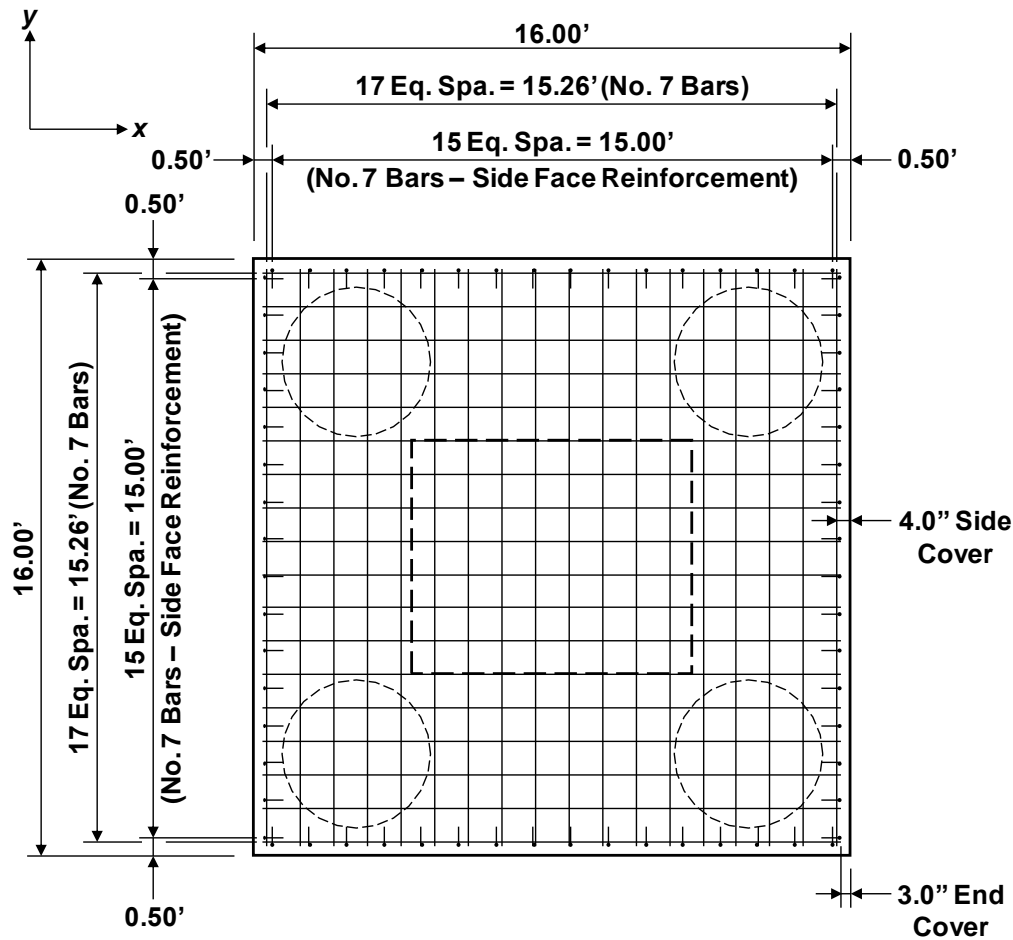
Reinforcement details – plan view (top mat reinforcement)
